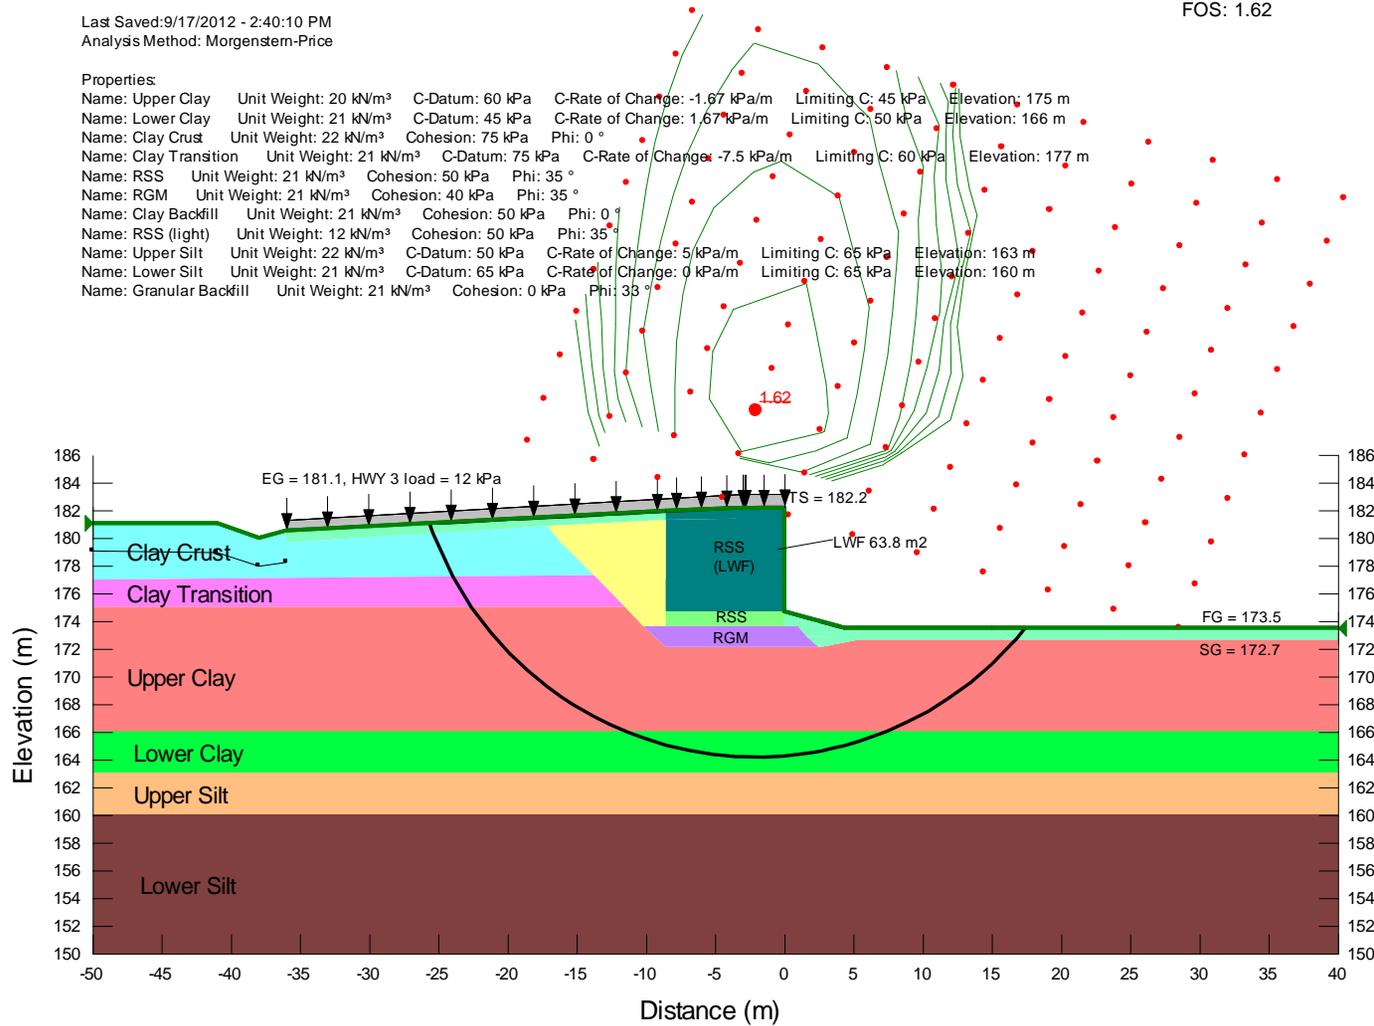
Global Stability Result – Extended Wing Wall North (10+200) – Long Term (Drained) Loading
